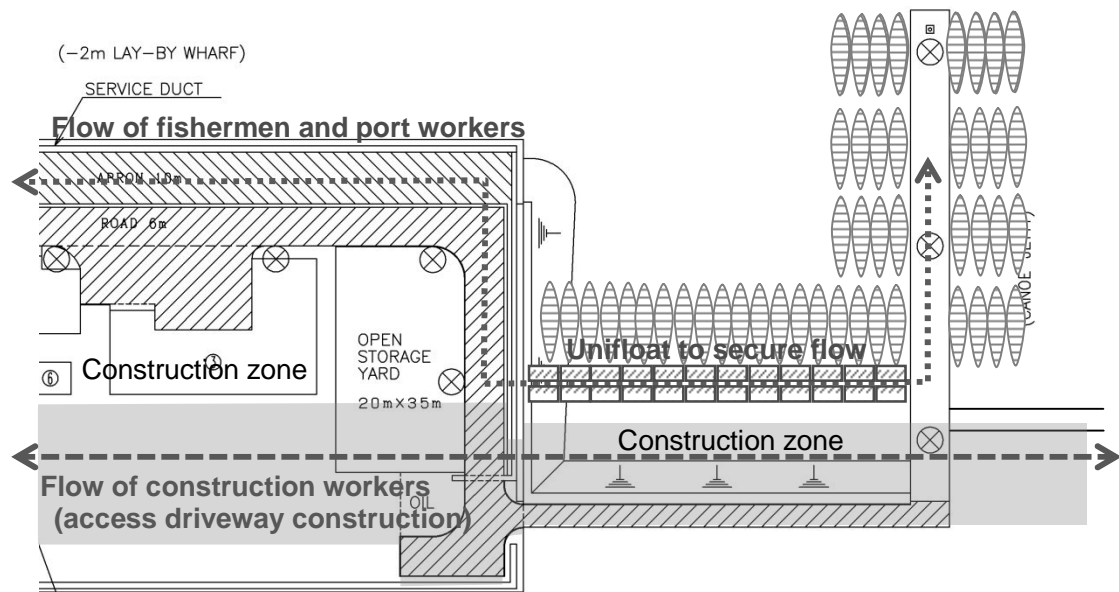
(3) Secure Flow of Fishermen using Temporary Floating Road (Unifloat) during Construction
